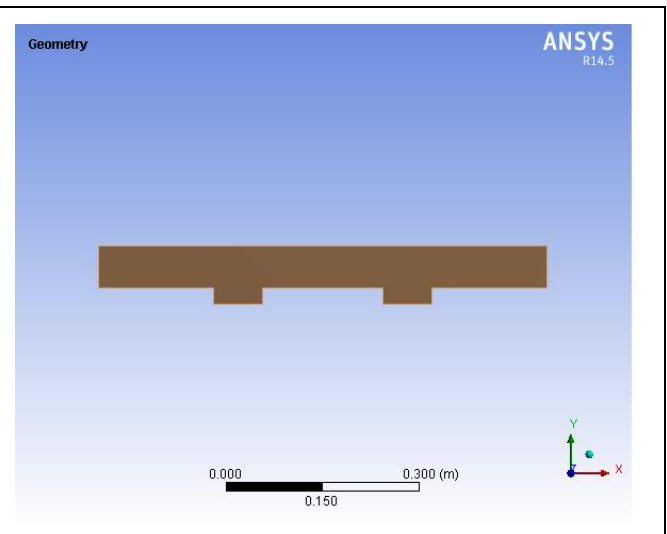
(B) Geometry of Bridge span with two stiffeners
